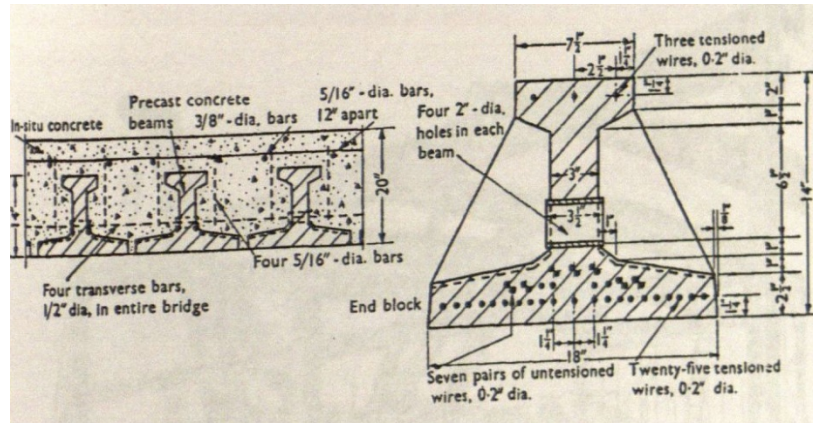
Bridge deck with non-prestressed reinforcement of high strength steel wire
